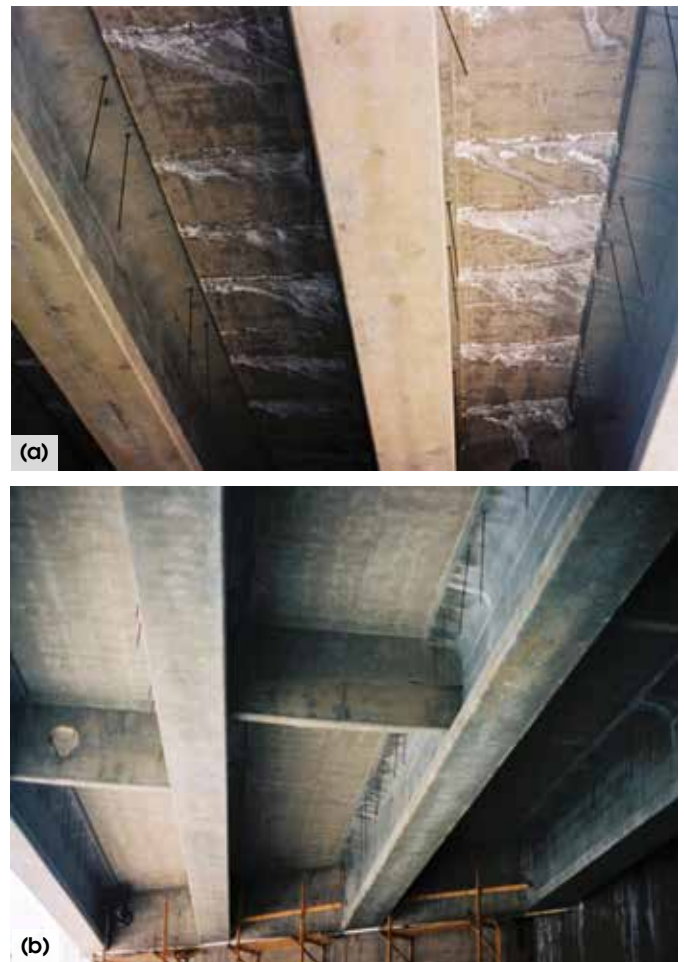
Cast-in-place decks and spliced precast bulb-T girders on I-80 near Truckee, CA: (a) deck constructed without SRA; and (b) deck constructed with SRA (photos courtesy of Ric Maggenti)
